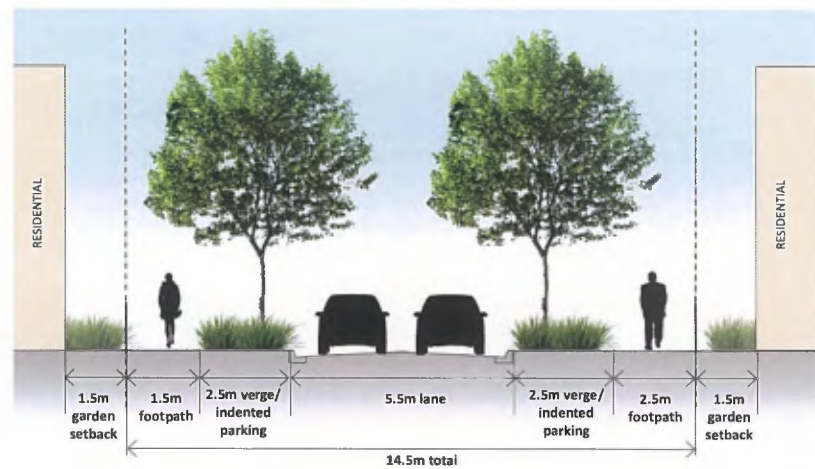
SECTION E-E - EAST WEST STREETS & WORKSHOP PARK STREET
